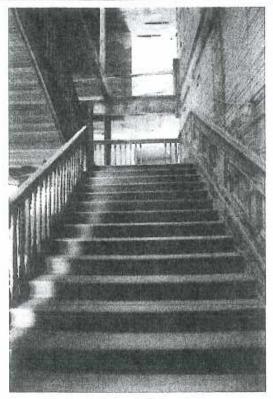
Level 2 to Level 3 Stairwell view west up stairs
